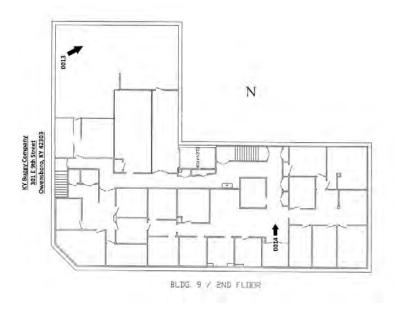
KY Buggy Co, Second floor plan, keyed to photo log below.
